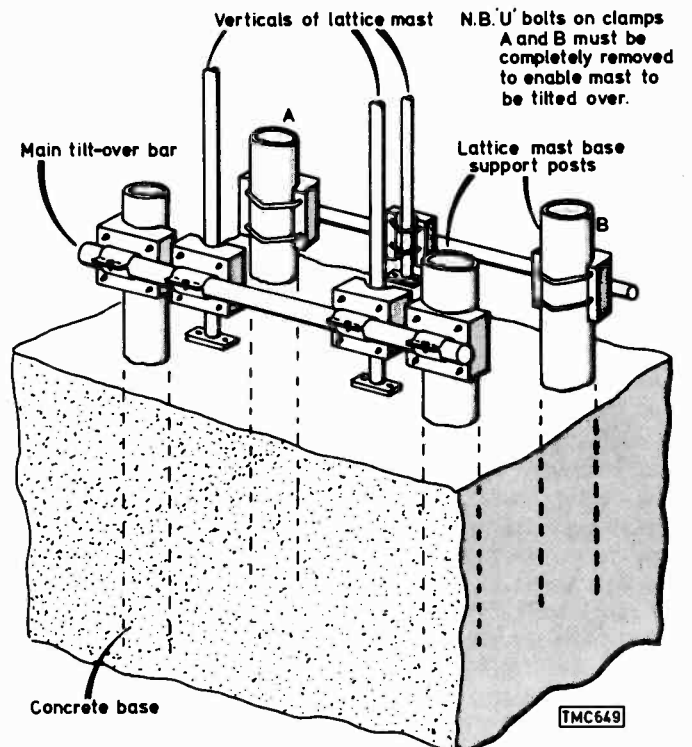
Lattice tower tilt assembly, showing the clamping arrangement.
